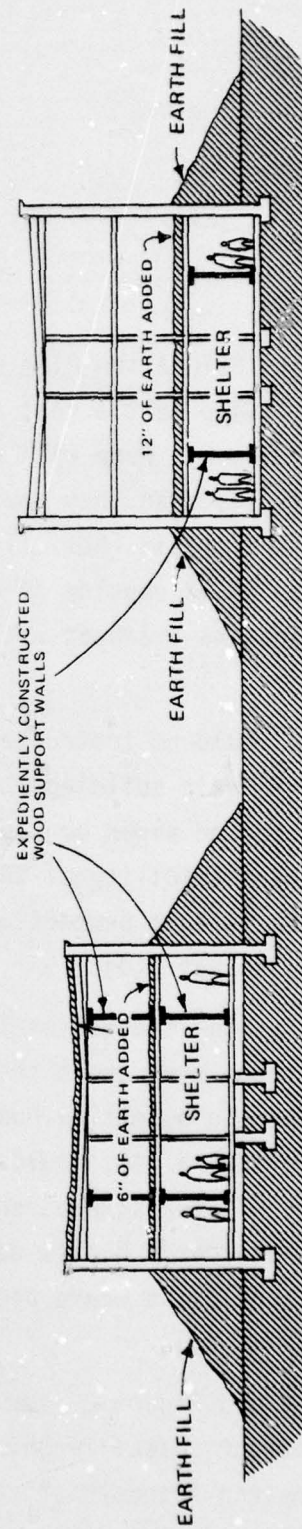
FALLOUT PROTECTION IN SCHOOL BUILDINGS
